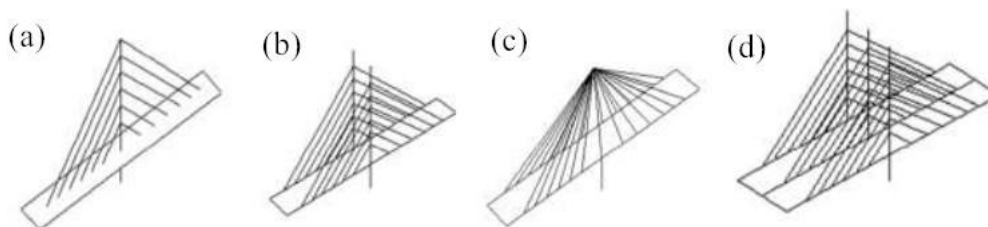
Different types of bridges: (a) single-plane bridge, (b) double-plane bridge, (c) inclined-planed bridge, (d) multiple-plane bridge (Olamigoke, 2017)
